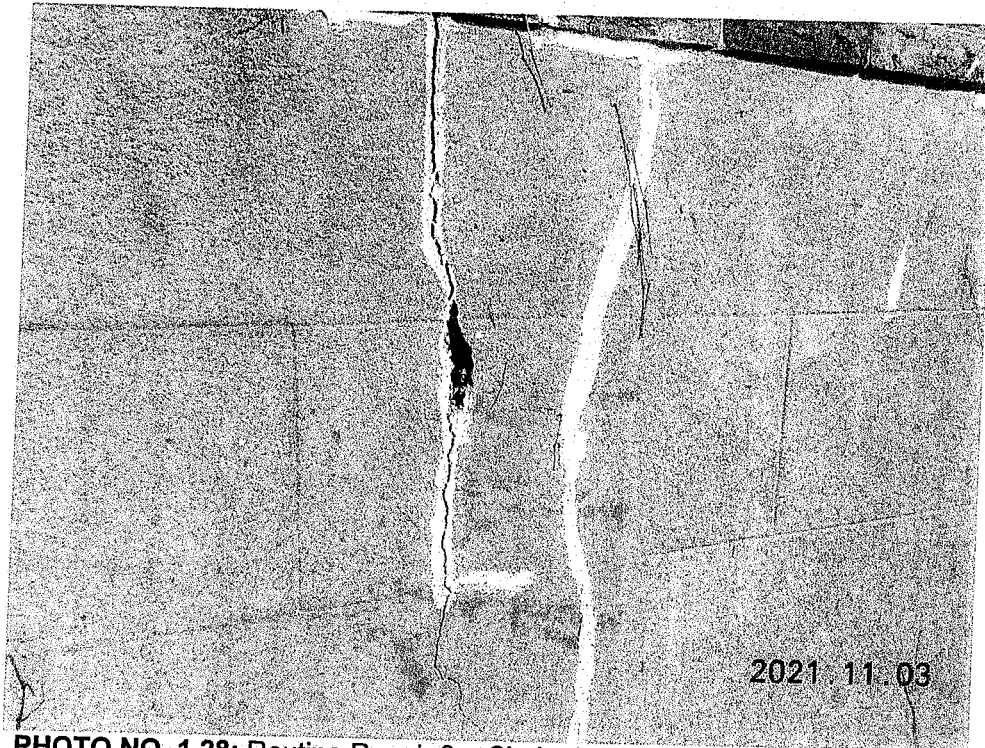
Routine Repair 3 – Cinder block exterior wall with parge coat
